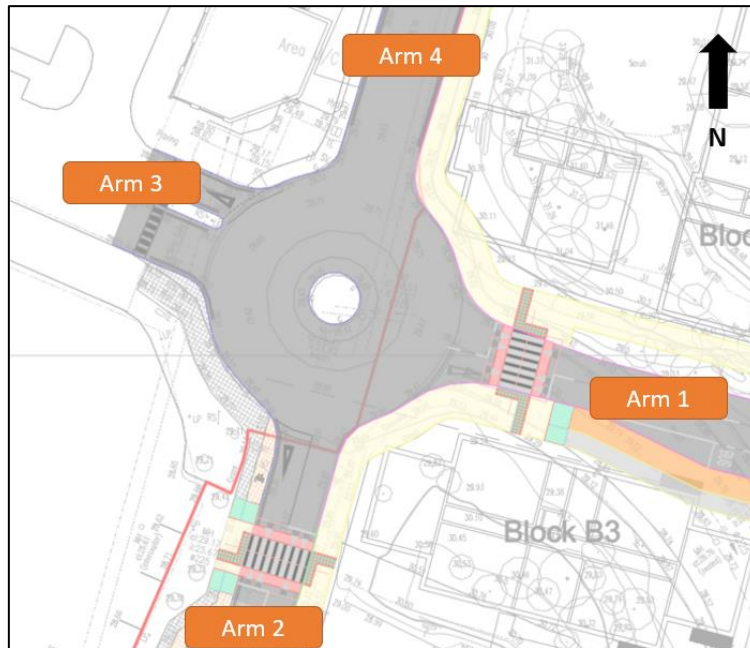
Junction 1 Gateway Retail Park Roundabout
